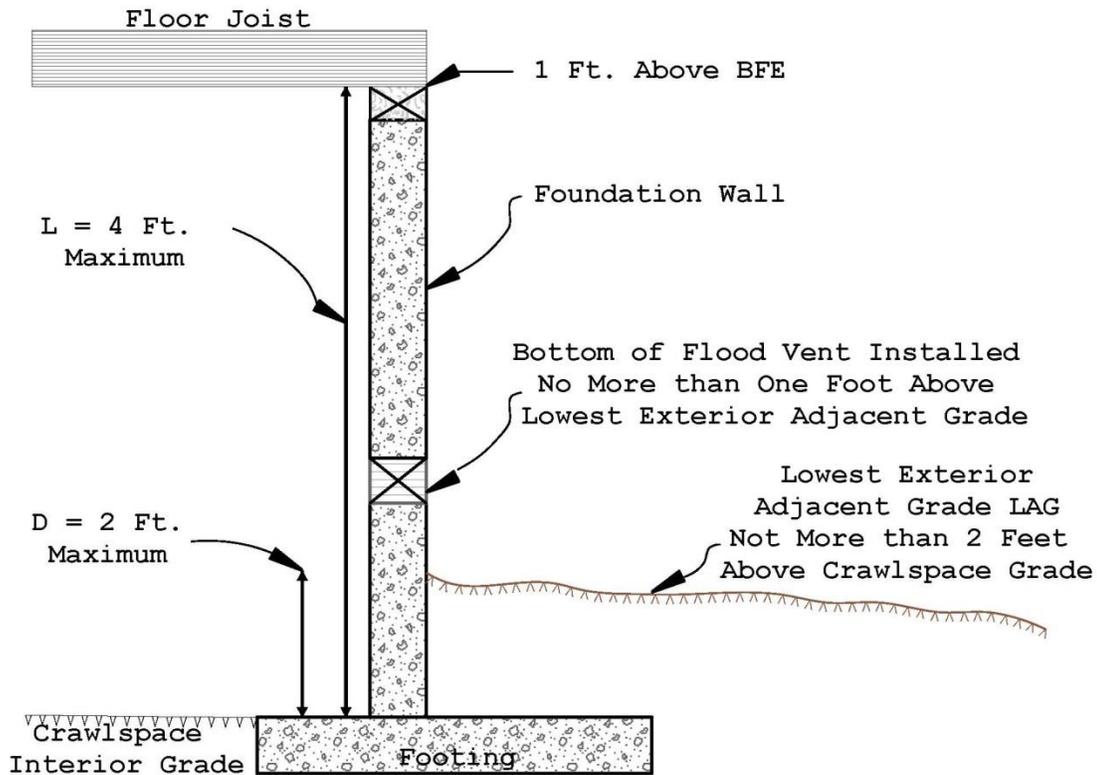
REQUIREMENTS OF BELOW-GRADE CRAWLSPACE CONSTRUCTION
